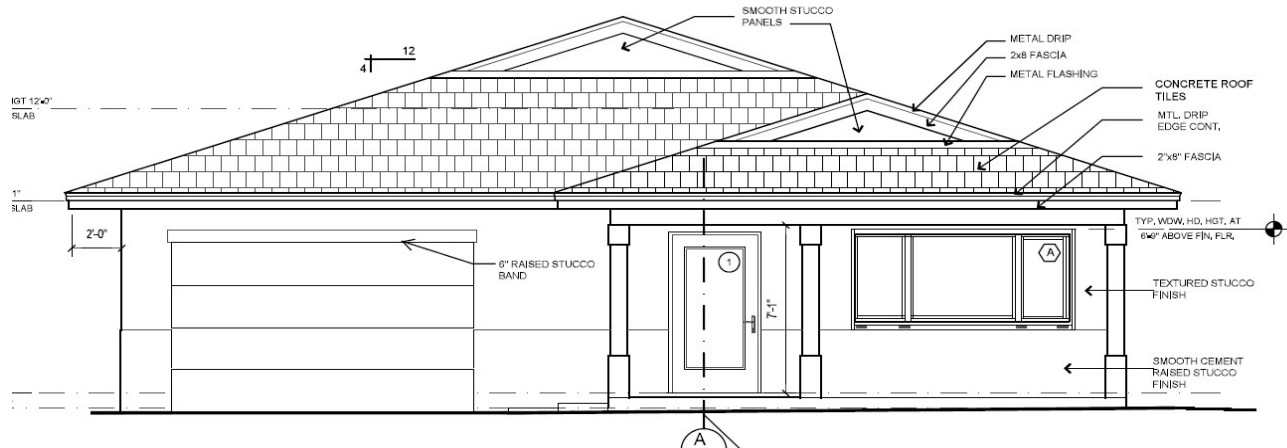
Front Elevation 403 S M Street (As Proposed)
